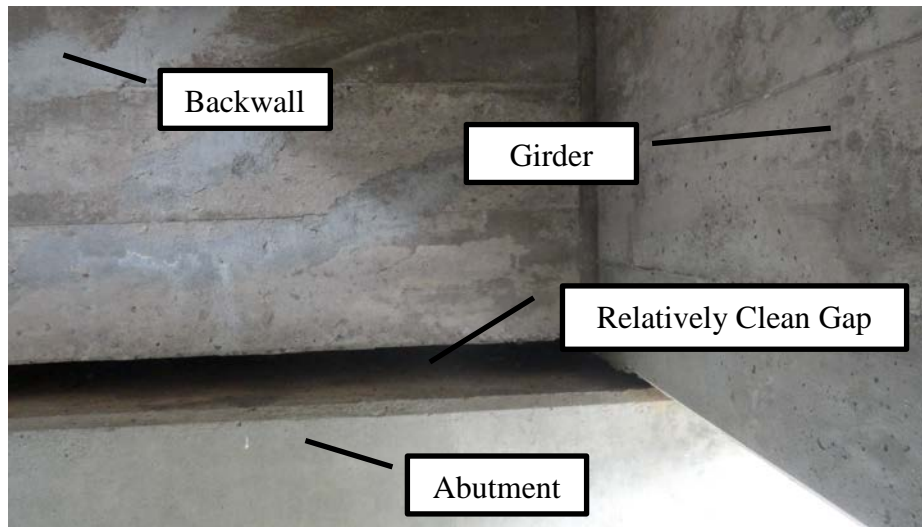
Condition of Gap Between Abutment and Backwall – Bridge 5432
